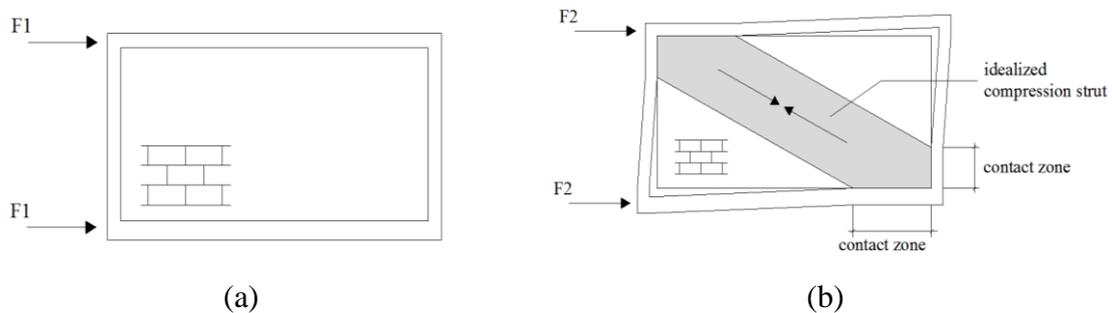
Different behavior stages of reinforced concrete frames with infill walls when subjected to horizontal loads: (a) stage 1; (b) stage 2 (Mehrabi et al. (1994), (1996)).
